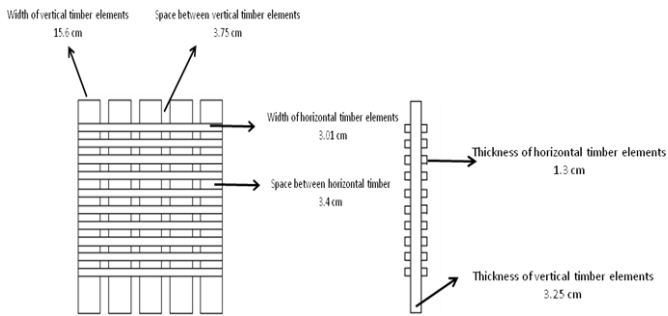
Detail for the timber structure of a typical exterior tabique wall
